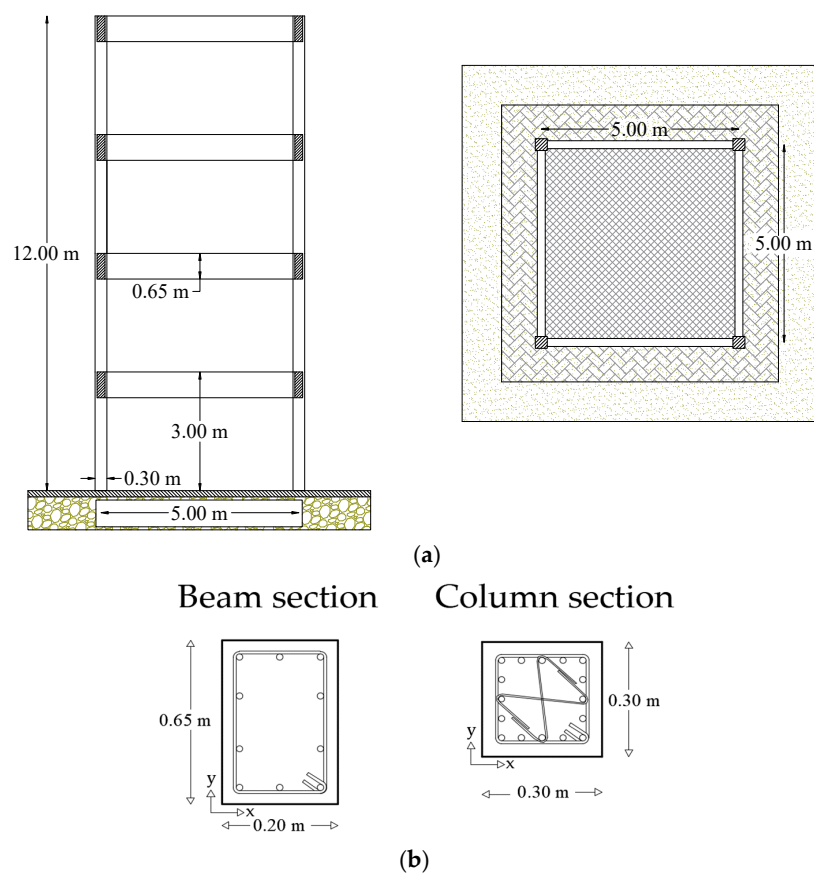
Structure lateral view and cross section (a), beam and column cross section (b).
